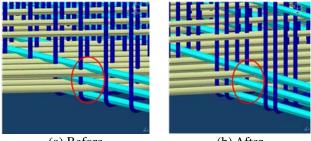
Rearranging rebar terminators at core wall anchorage zone to prevent clash
